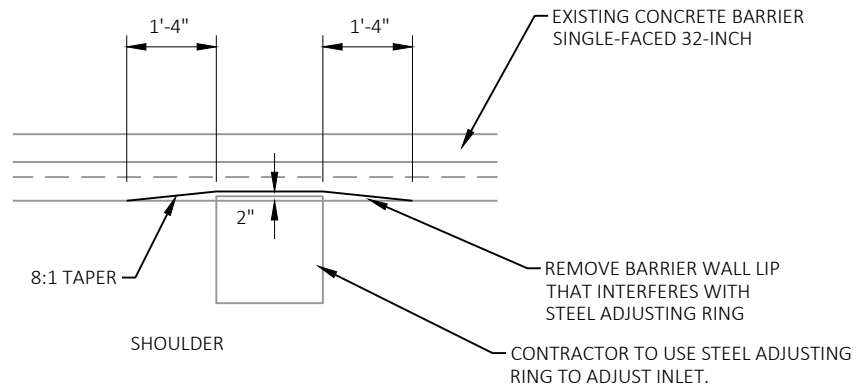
DETAIL OF INLET ADJUSTMENTS AT BARRIER
